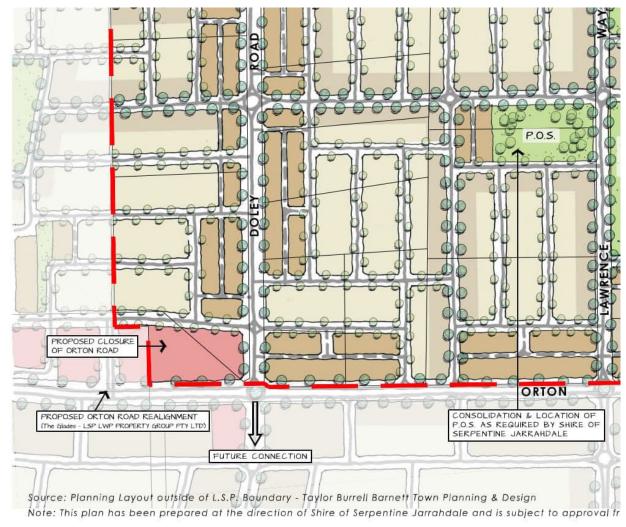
Proposed Future Orton Road Realignment Concept (KCTT)
